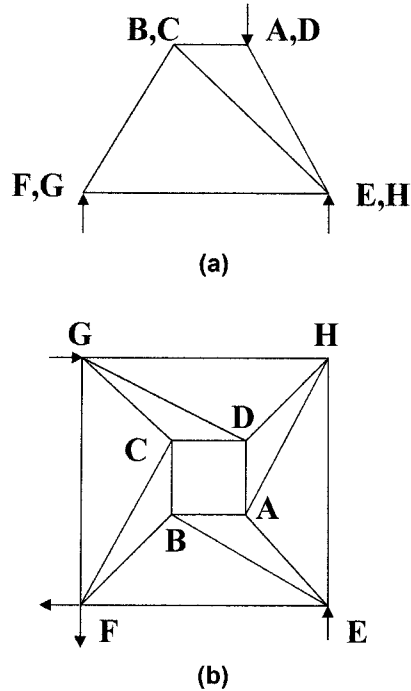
Example problem for Schwedler dome. (a) Elevation. (b) Plan.
